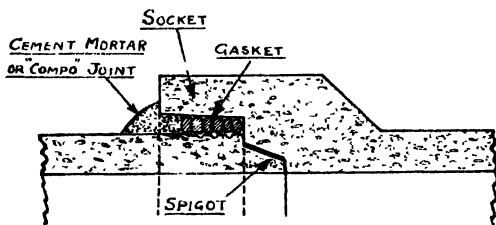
SOCKET AND SPIGOT CONCRETE PIPE JOINT
